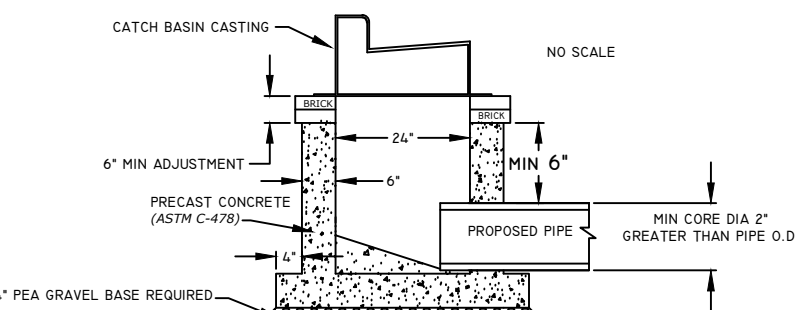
DETAIL FOR: DRAINAGE STRUCTURE COVER,
